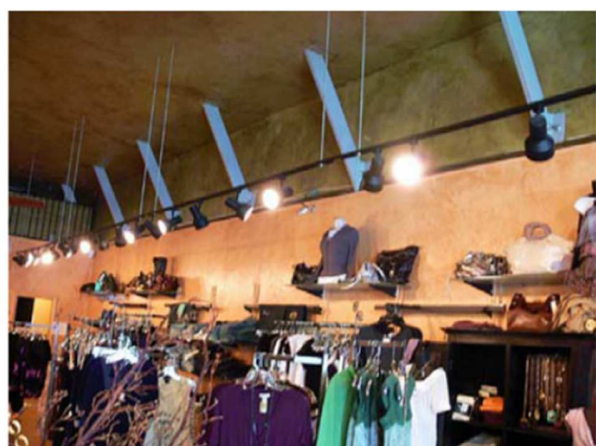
Diagonal struts from the floor above to improve out-of-plane performance of the wall
